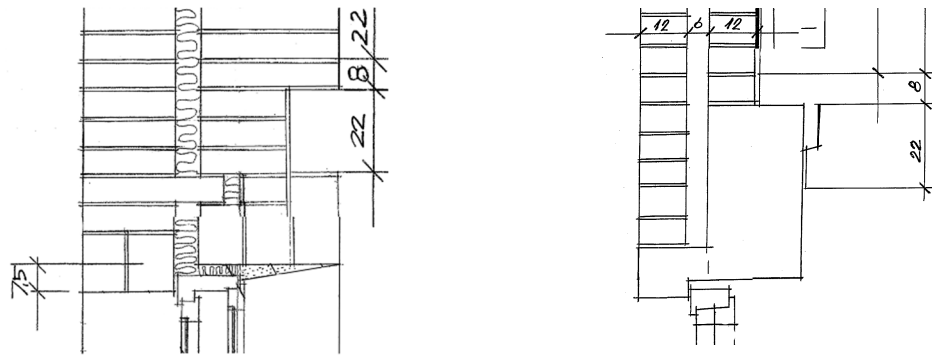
Connection of the external wall and window of studied brick apartment buildings.
